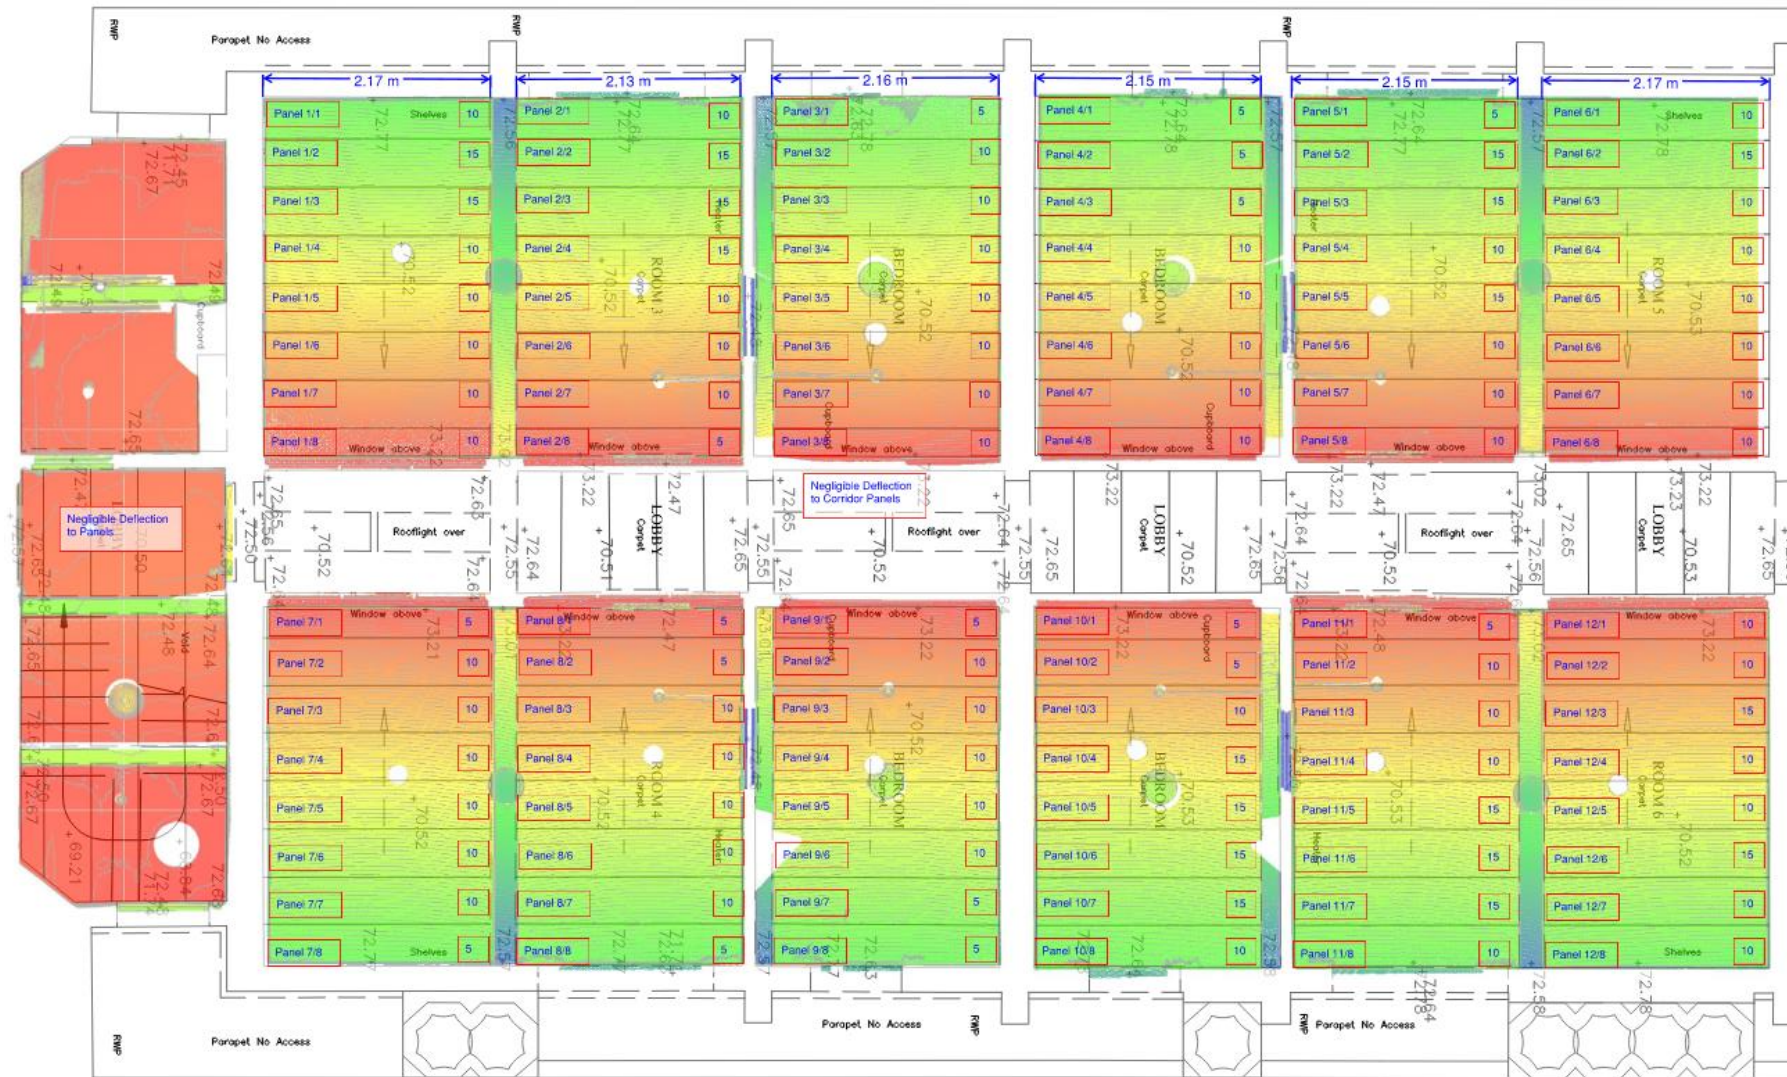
Batchelor’s Row – South – Roof Soffit Contours (James Brennan Assoc)
